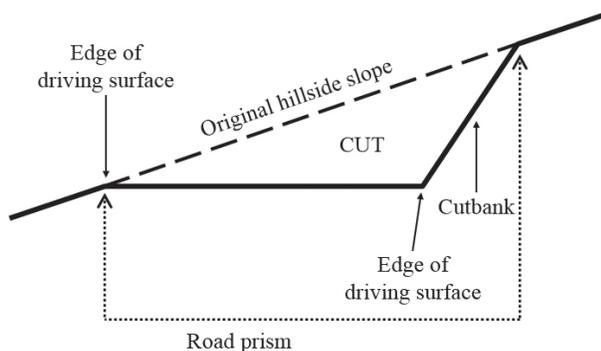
Schematic of a full bench construction road. The road driving surface is entirely within the cut area since a fillslope is not developed in full bench construction.
